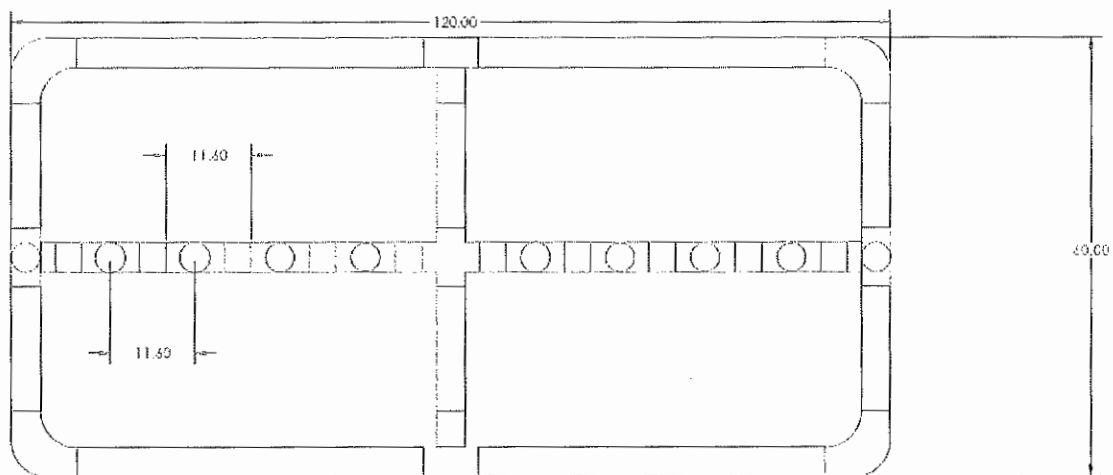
Top view of the prototype floating wetland breakwater frame, showing the top dimensions in inches.
